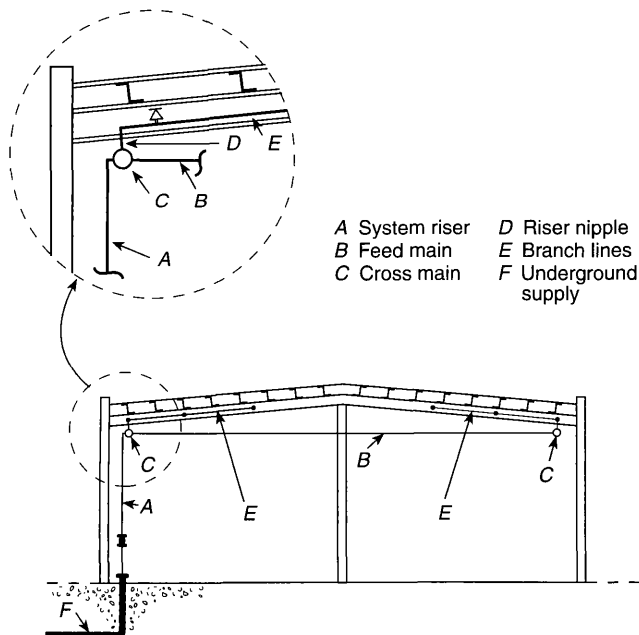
Building Elevation Showing Parts of Sprinkler Piping System.
